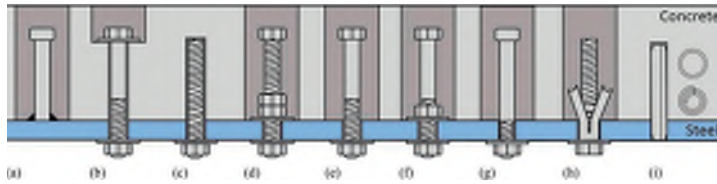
Examples of different types of postinstalled shear connectors: (a) welded headed shear stud; (b) high-tension friction grip bolt; (c) adhesive anchor; (d) double-nut bolt; (e) bolt without embedded nut; (f) single-nut bolt; (g) threaded shear stud; (h) blind wedge or sleeve anchor bolts; and (i) interference-fit pins (slotted spring pin and coiled spring pin).
